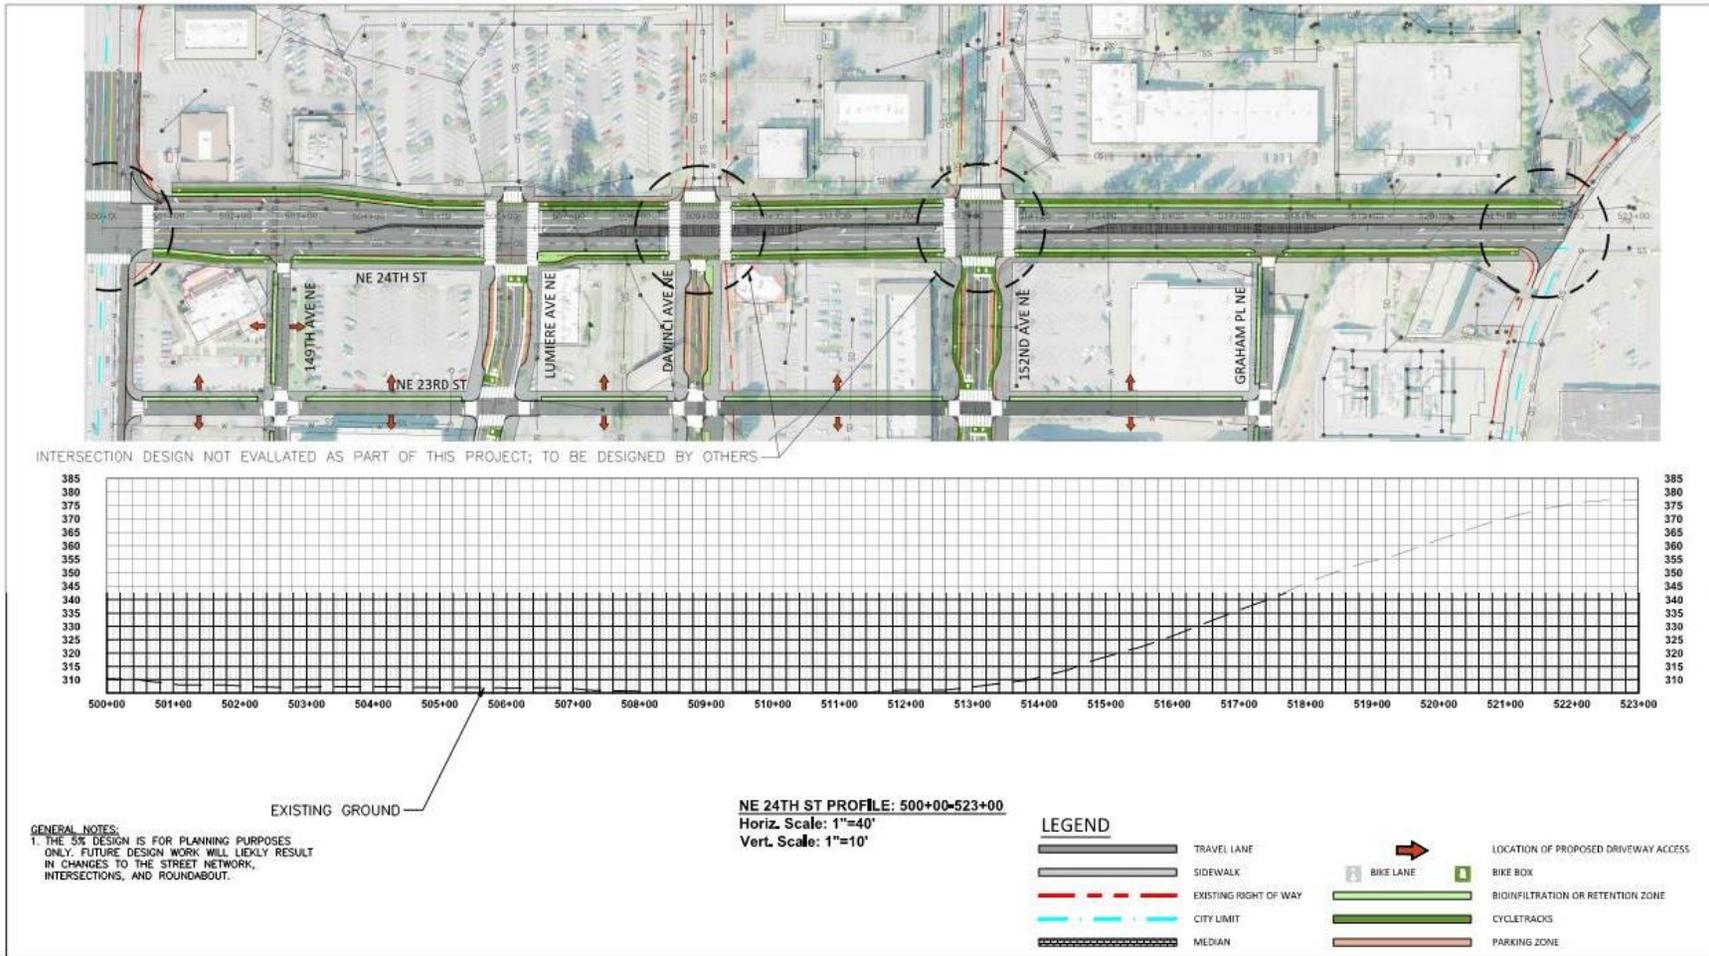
NE 24th Street Preferred Concept Plan & Profile
